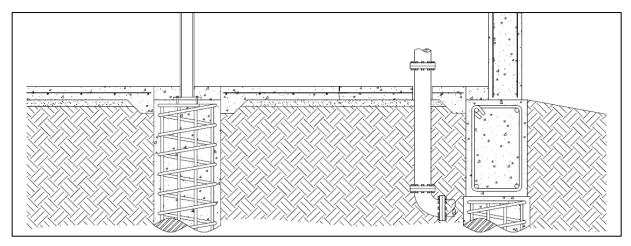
Representative view of a conventionally reinforced concrete (floating) slab-on-grade foundation prior to a fire riser rupture
